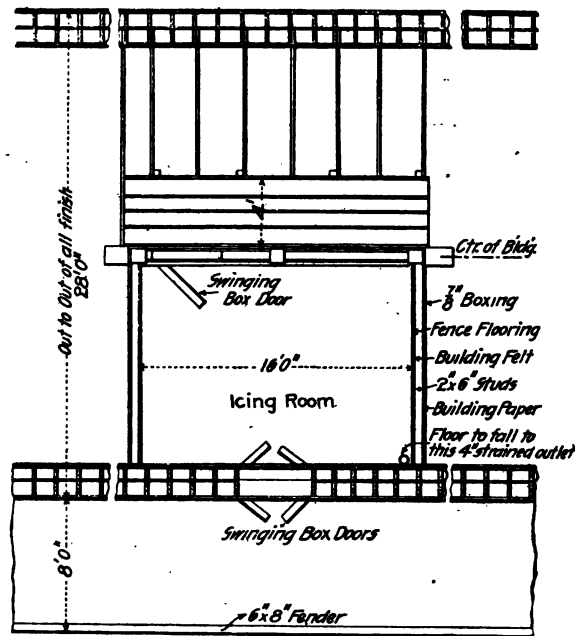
Plan and Elevation of C., B. & Q. Icing Plant at Hannibal, Mo.
